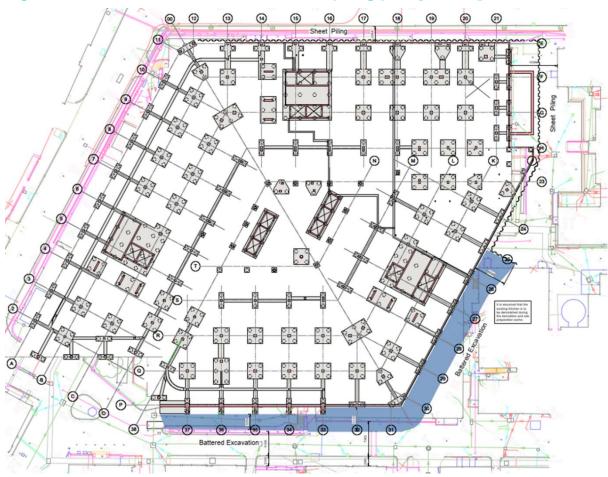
Basement excavation and sheet piling plan [Extract]
